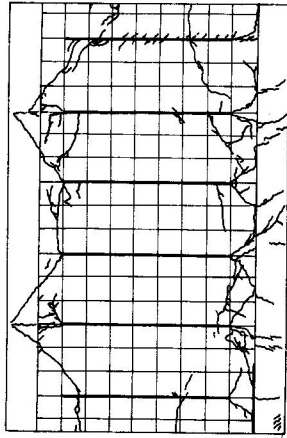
FINAL CRACK PATTERN OF PANEL C
